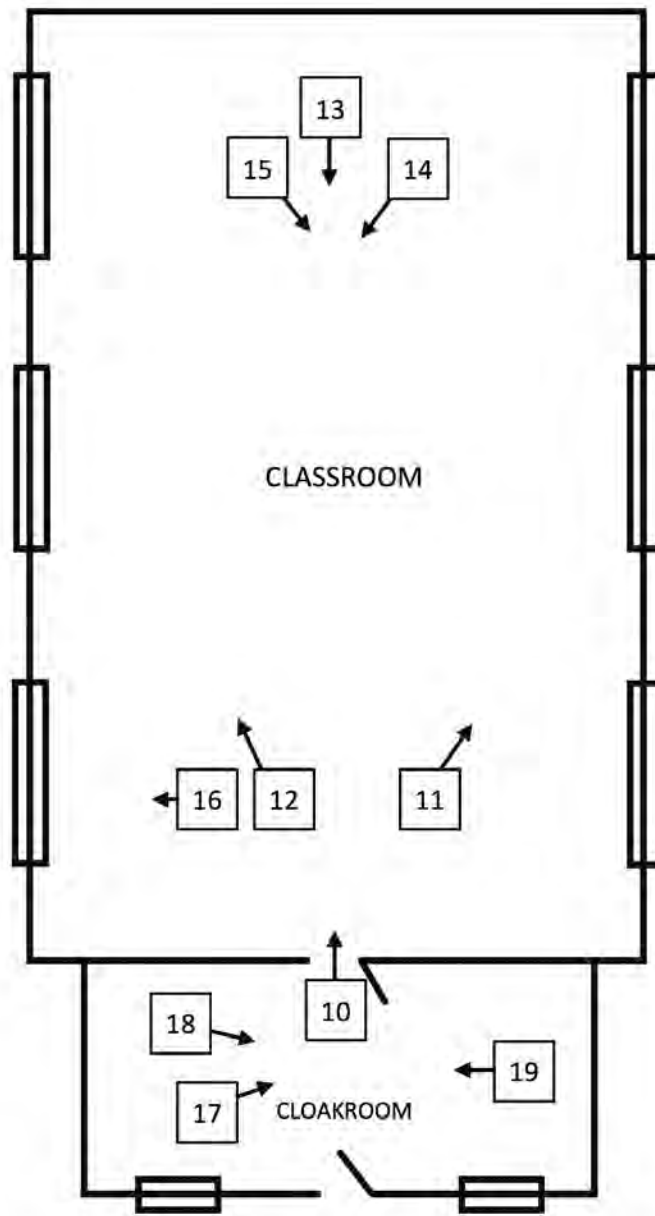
Floor Plan & Photo Key (Photos 10-19)
